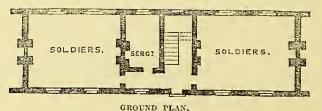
exhibits an example of this arrangement. It is a flat of one of the soldiers' houses in Templemore barracks. It shows the staircase, separate serjeants' room, and two soldiers' rooms 20 ft. 2 in. wide, with two windows on each of the opposite sides. These rooms are intended for 15 men each, but at that number they are considerably overcrowded, affording an example of excellent barrack construction, with overcrowding and a total want of ventilation. With 10 men per room, and proper means for renewing the air, these would make good barrack rooms; but, in the meantime, the necessity of observing these equally important conditions for health has not been recognized, affording an example of the absence of sanitary method within barrack buildings similar to what we have shown to exist without.
